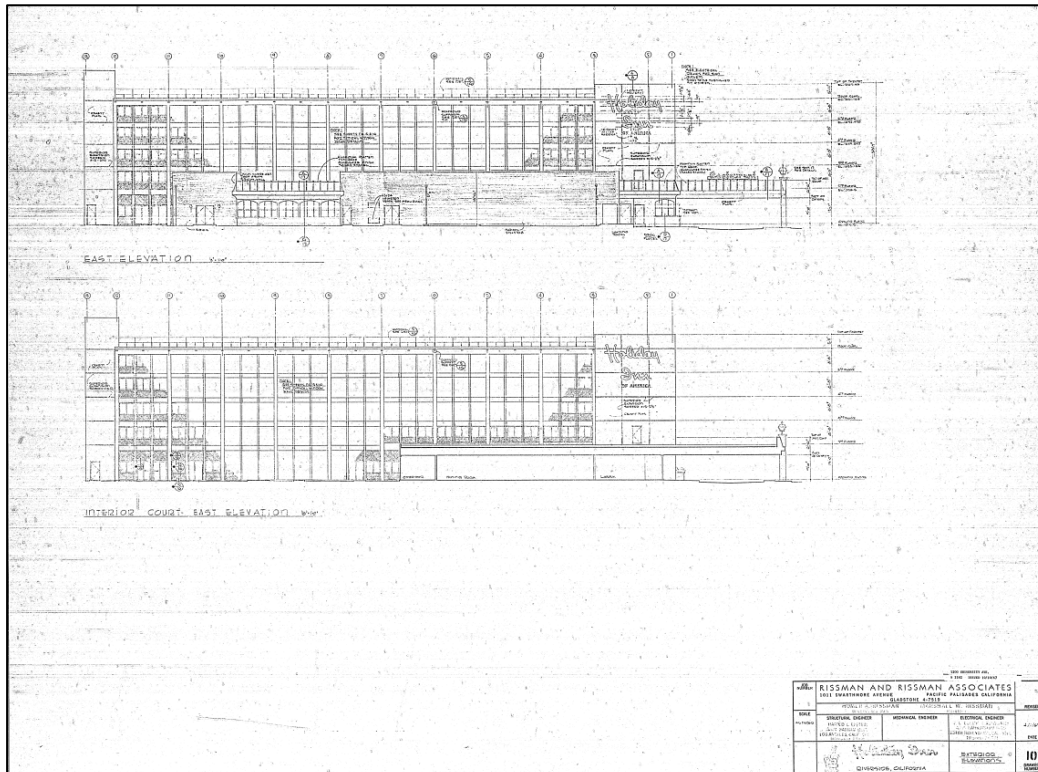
East elevations, 1968 (Rissman & Rissman Associates)
